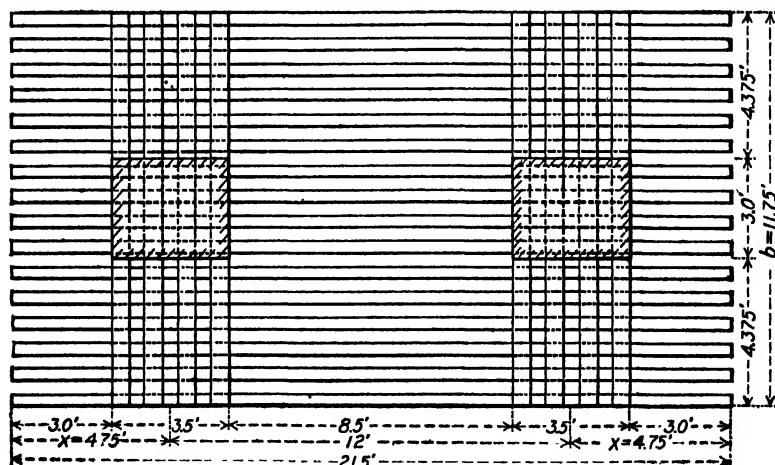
Double-Column Footing of Steel I-Beams.
